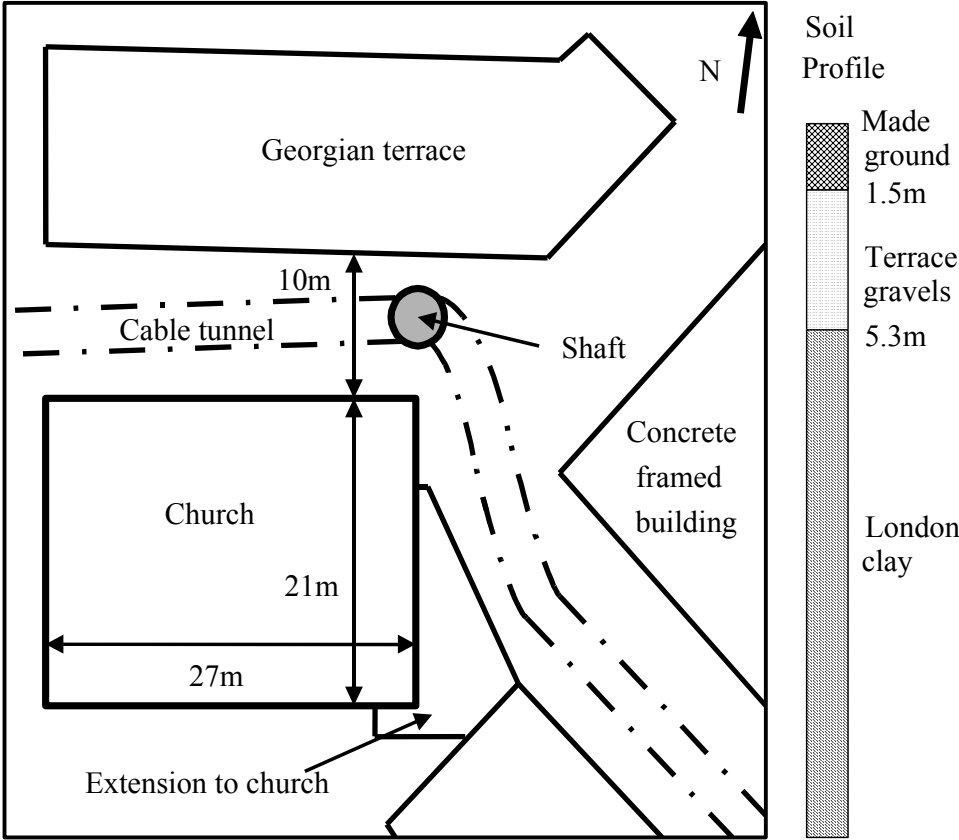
Plan on Maddox Street site showing shaft, tunnel and surrounding buildings
